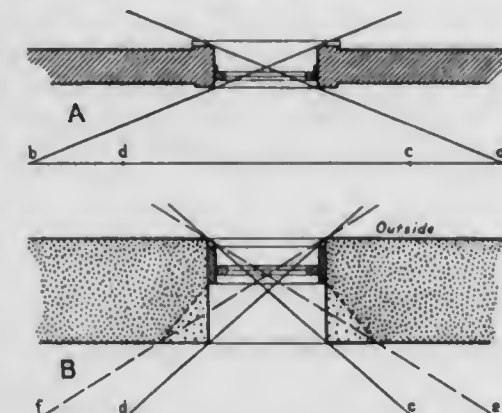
Effect of wall thickness on light distribution. (A) Plan of a window in a frame wall, facing south, 3 inches thick at the jamb. (B) Window of same width in a 22-inch masonry wall.
